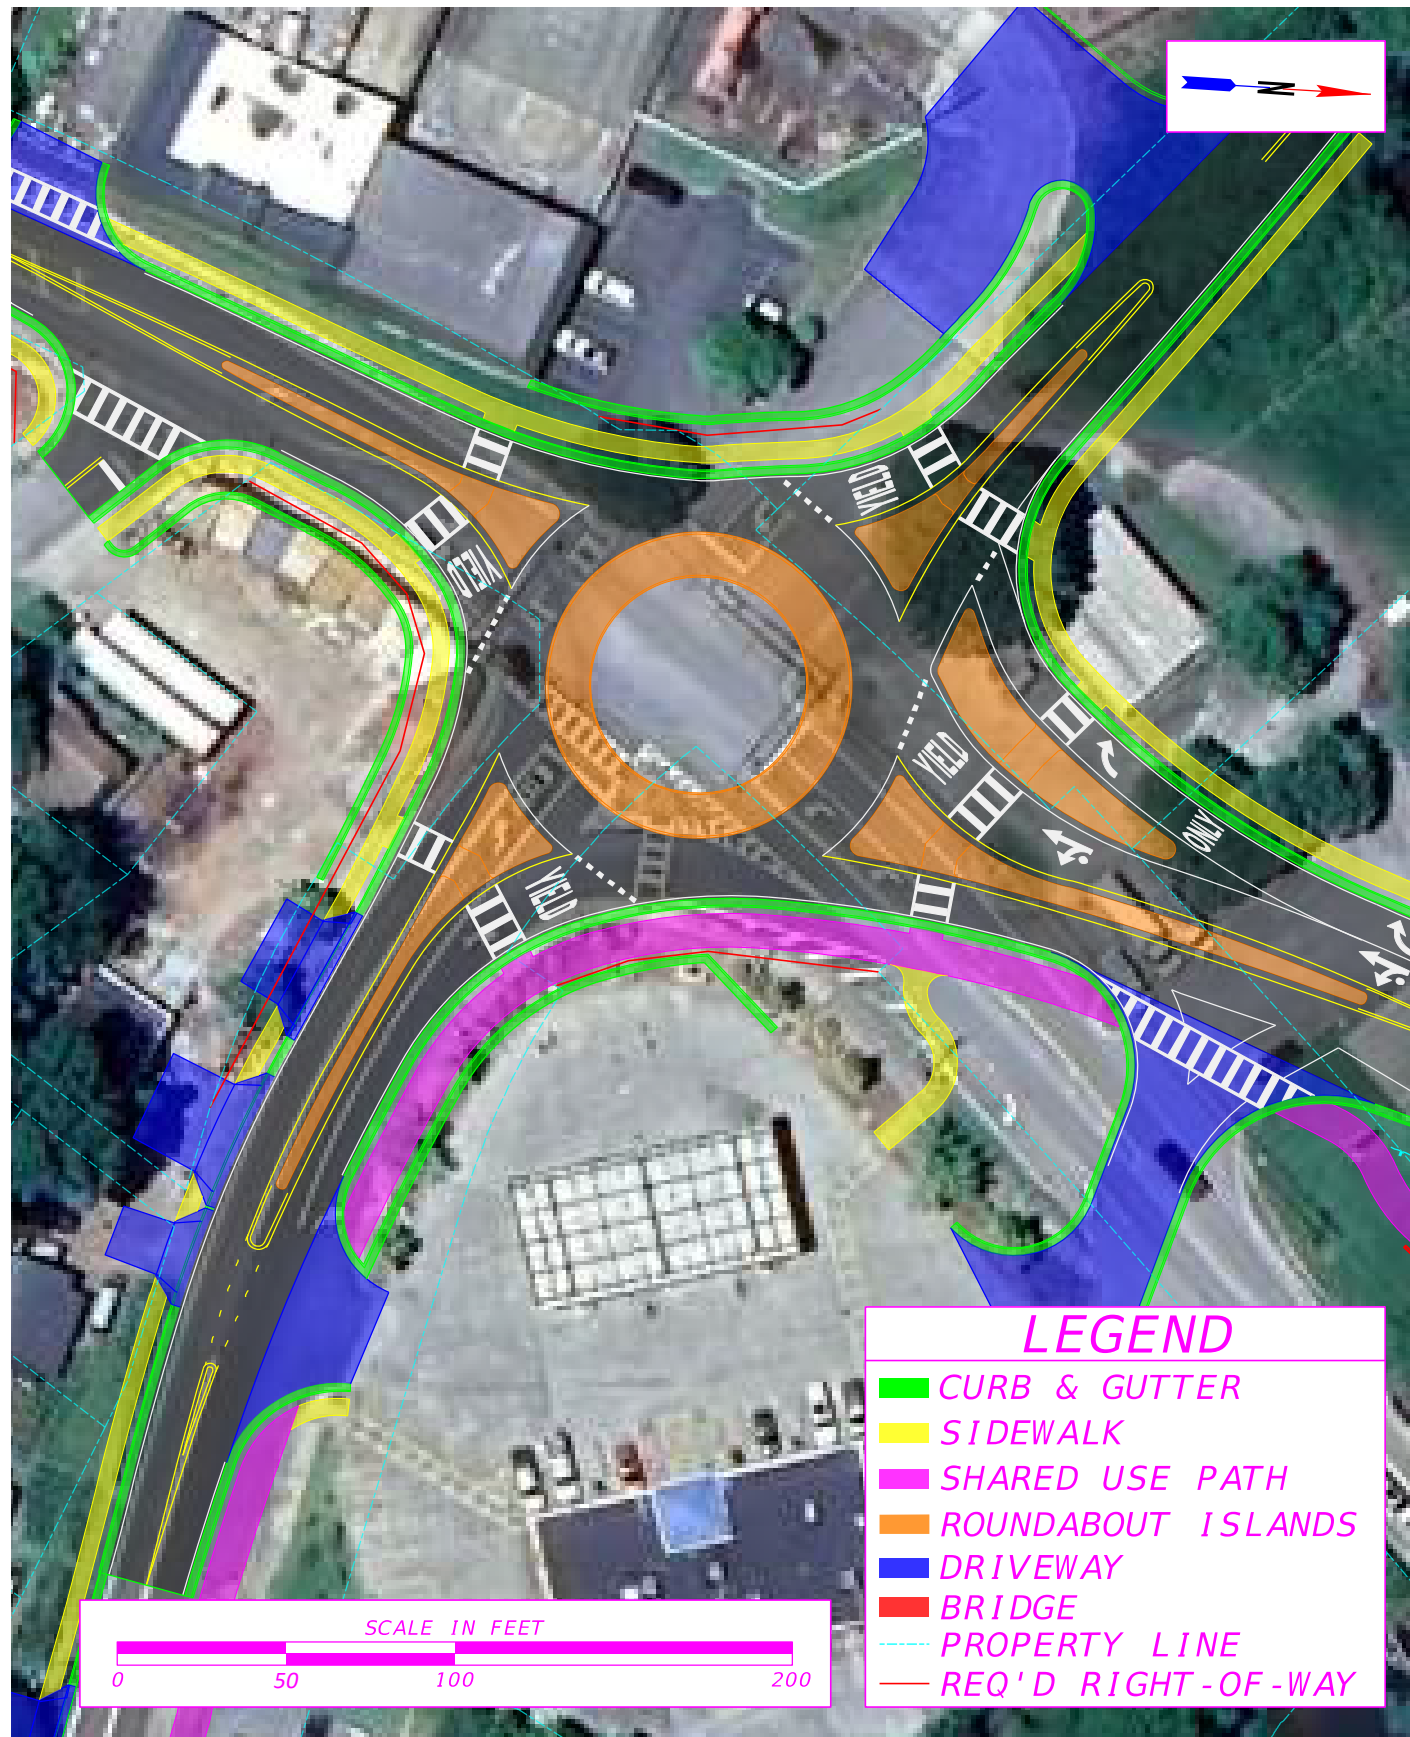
Roadway Concept - Hickory Flat Highway and Marietta Street Intersection
